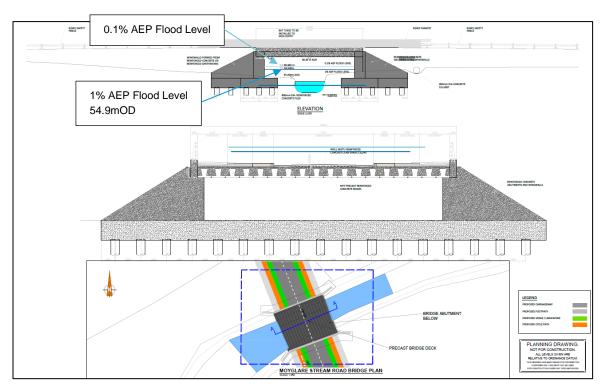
Proposed Bridge Layout- Road Bridge 2
